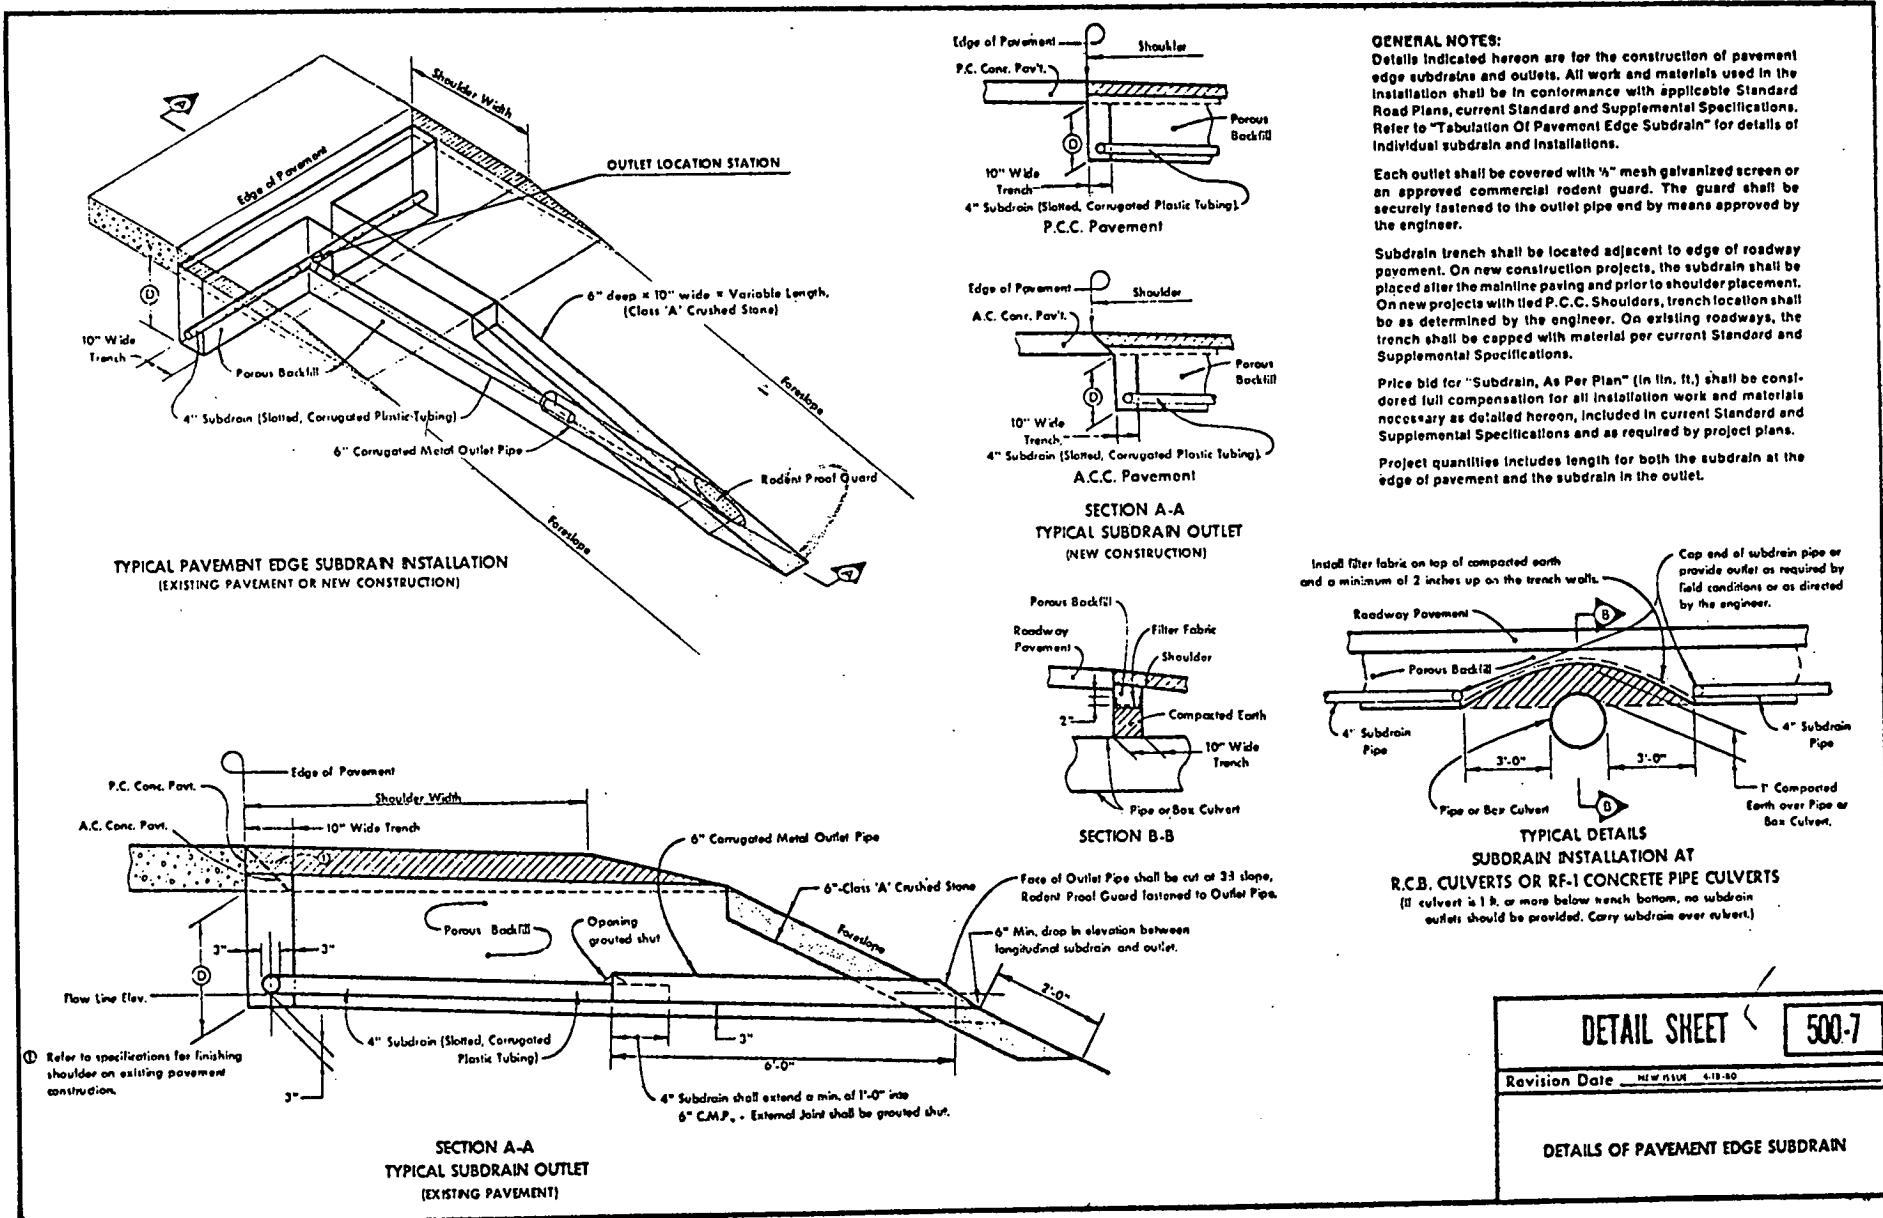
Details of longitudinal edge drain (Iowa) (60).
